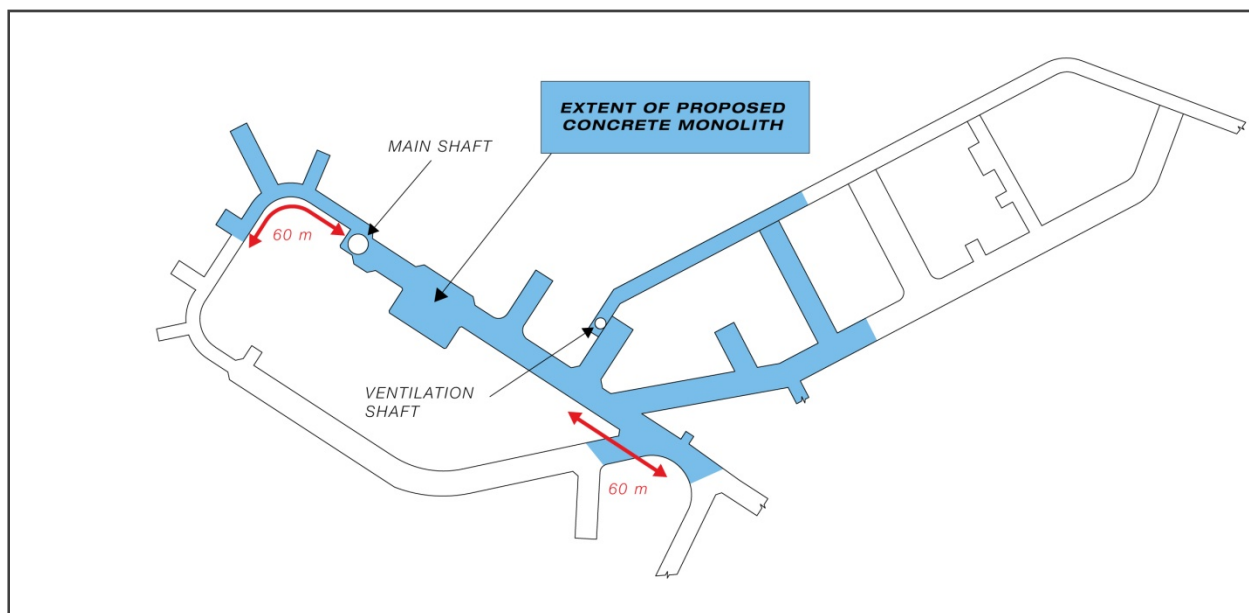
Extent of the Proposed Concrete Monolith
